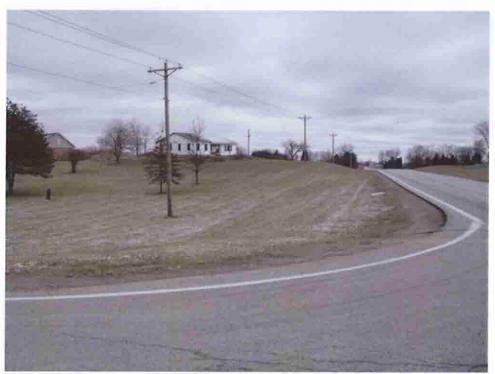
Supplement to Figure 15: Intersection S.R.36 & N. Mutual Union Rd (Facing Northeast)
